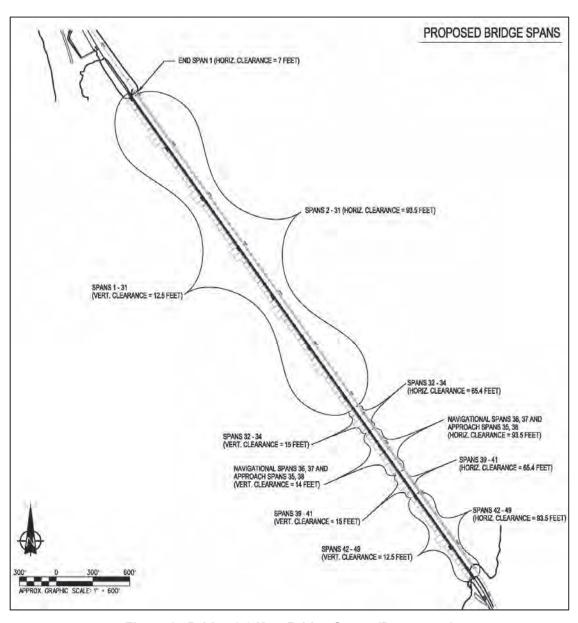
Bridge 3.9 New Bridge Spans (Permanent)
